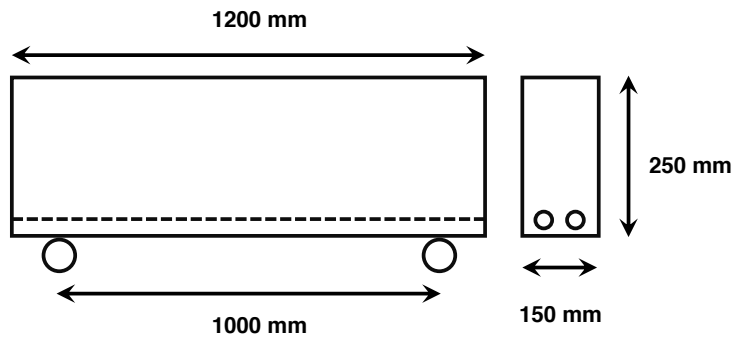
Geometry of the reinforced concrete beam. The rebars were placed at a distance of 45 mm from the bottom of the beam and the spacing was 60 mm.
